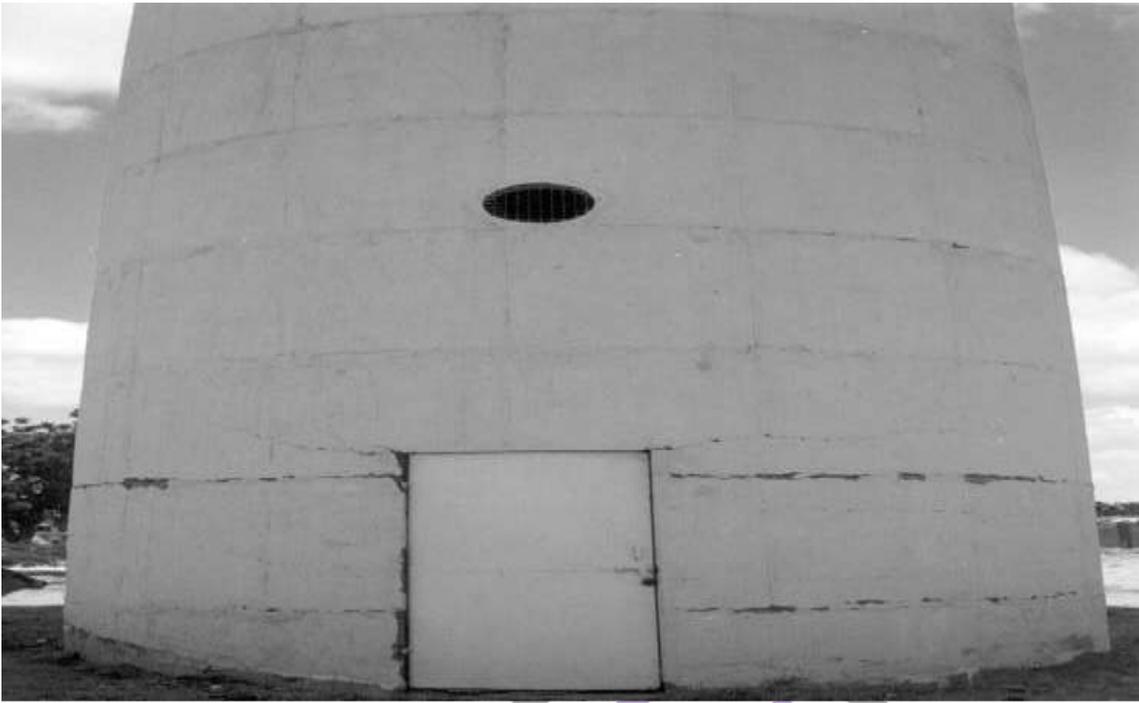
200 kLBhachau water tank which developed circumferential cracks up to one-third height of the staging. Severe cracking at the junctions of the first two `lifts`.
